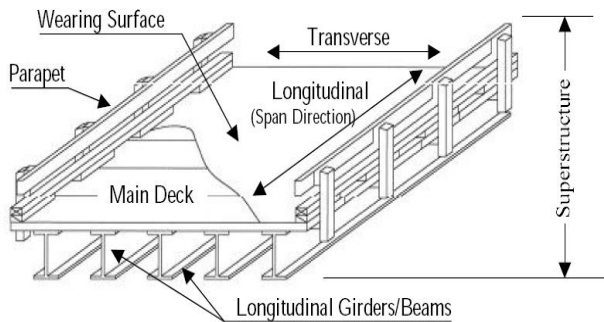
Superstructure of a bridge illustrating bridge engineering terms
